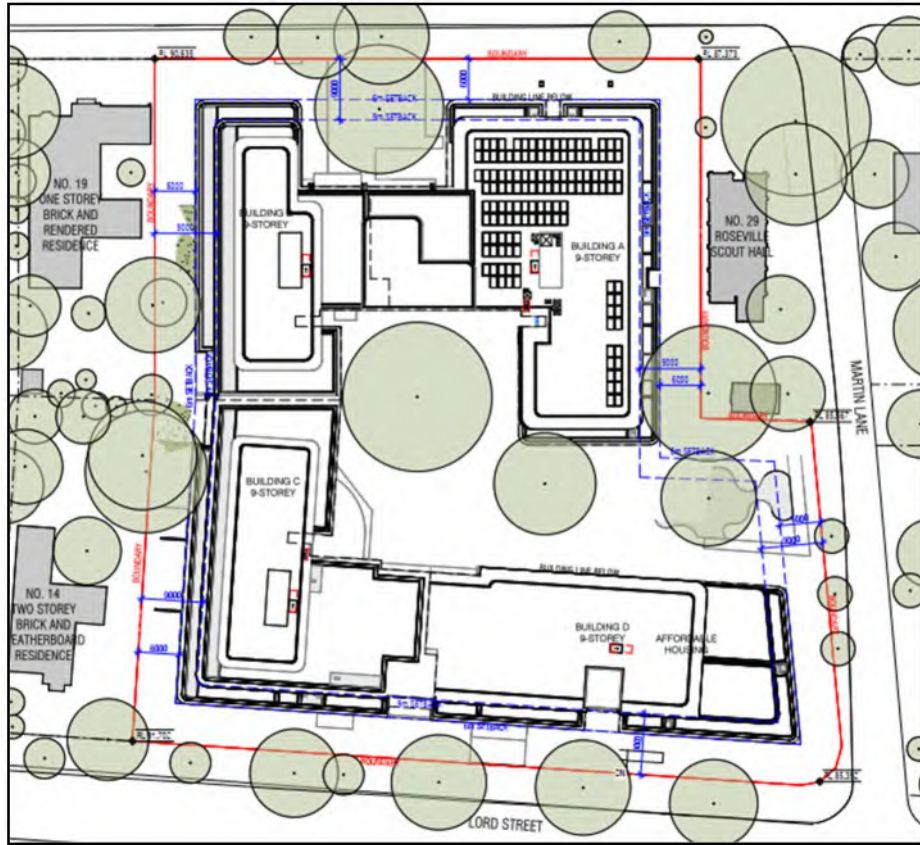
Site Plan extract showing the layout of the proposed development. Source: Fender Katsalidis 10.10.2025
